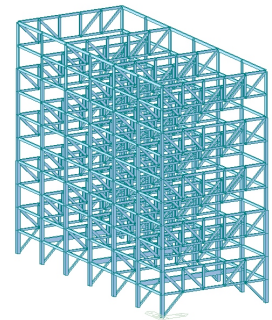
Structural behaviour of staggered truss framing system for the lateral loads
